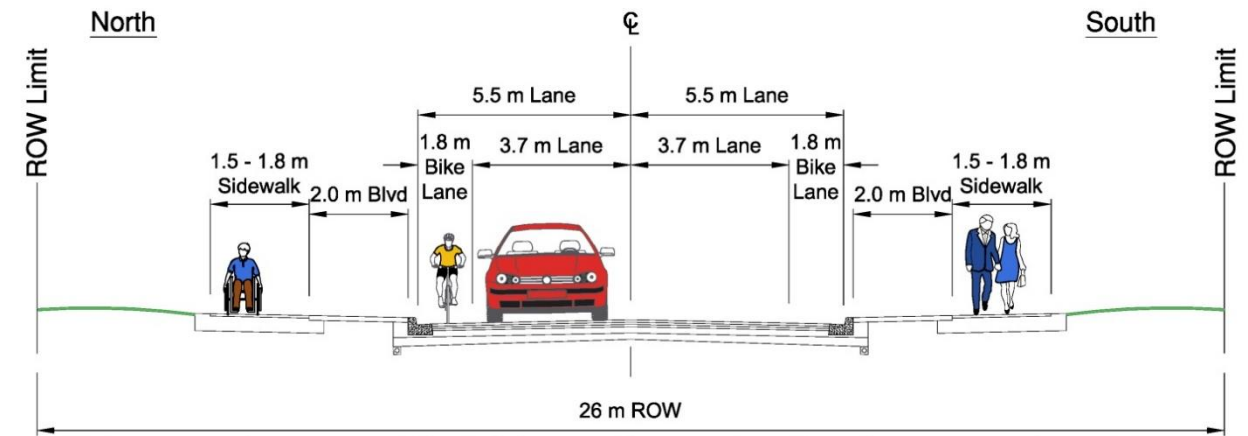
Alternative C2: 2-Lane Urban with Sidewalk and Bike Lane or Parking
